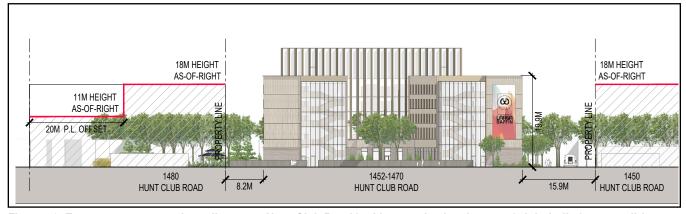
East-west cross section adjacent to Hunt Club Road looking south, showing as-of-right built-form condition along Hunt Club Road frontage
